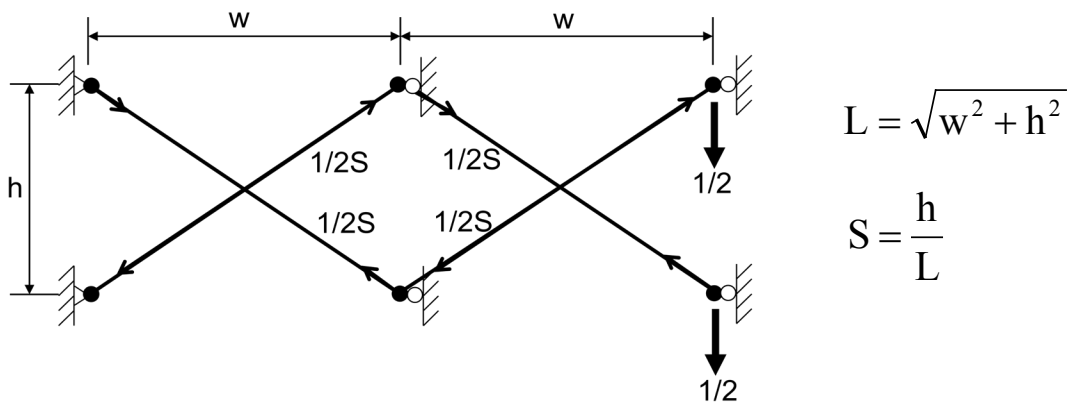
Belt truss in generic skyscraper subject to unit load
